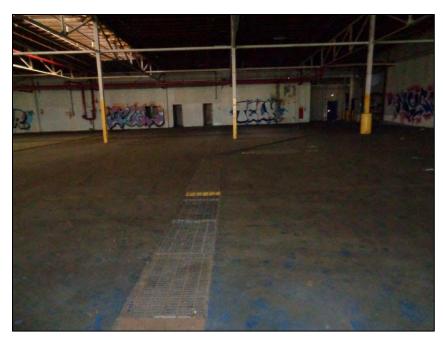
Star-Kist Plant No. 4, interior, warehouse/manufacturing area showing drains in floor, camera facing east. ICF, 2018.
